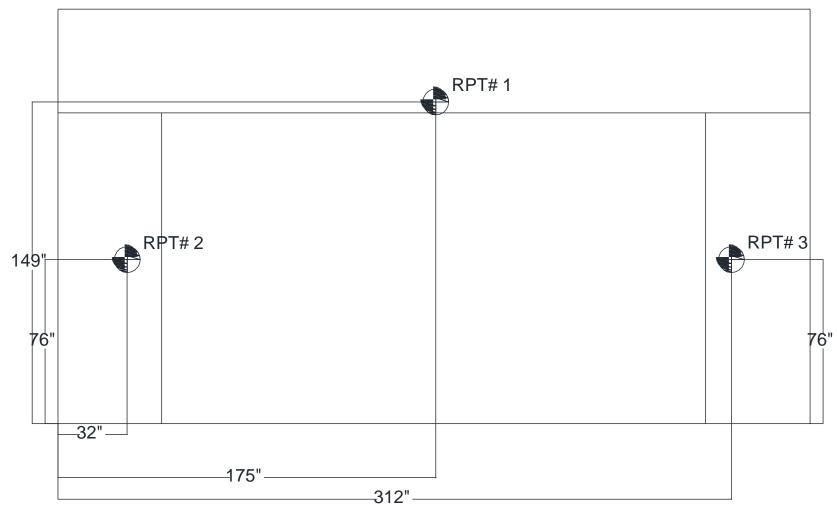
Test #2 Transducer Location – 7psi Chamber
